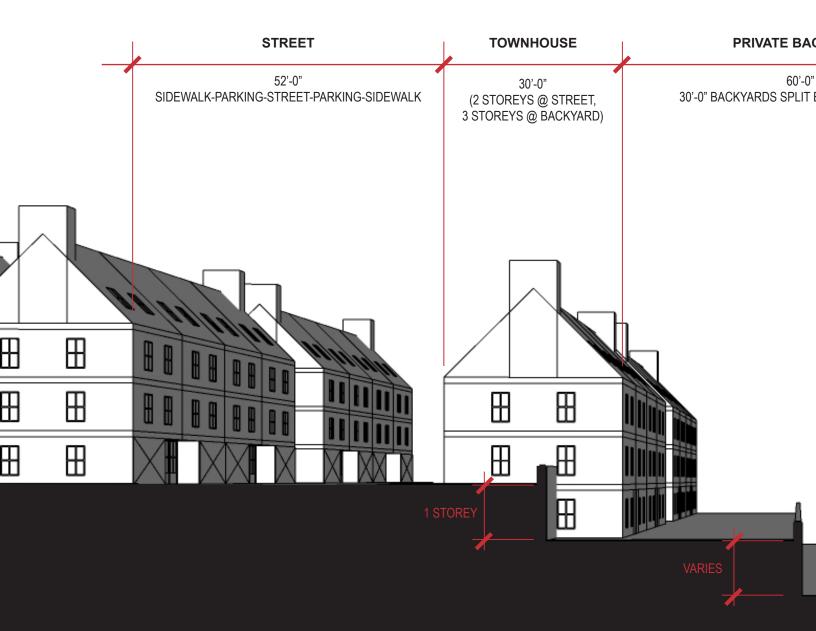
SLOPE CHANGE FROM STREET TO STREET
